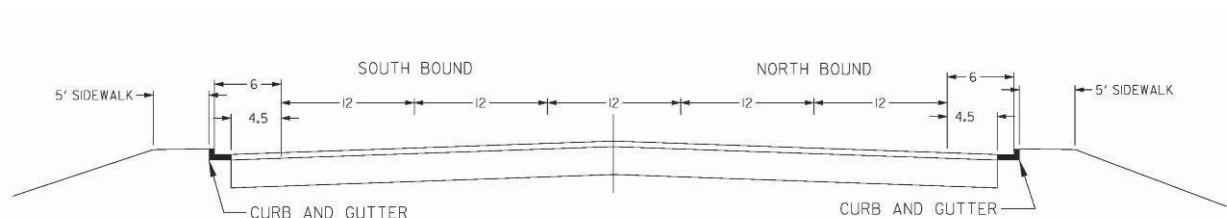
Typical Section: Four-lane Highway with Center Turn Lane and Curb, Gutter and Sidewalk
